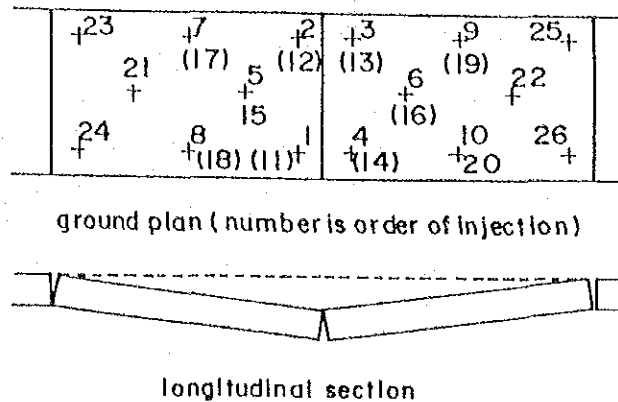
Example of Pushing Up the Concrete Slab
